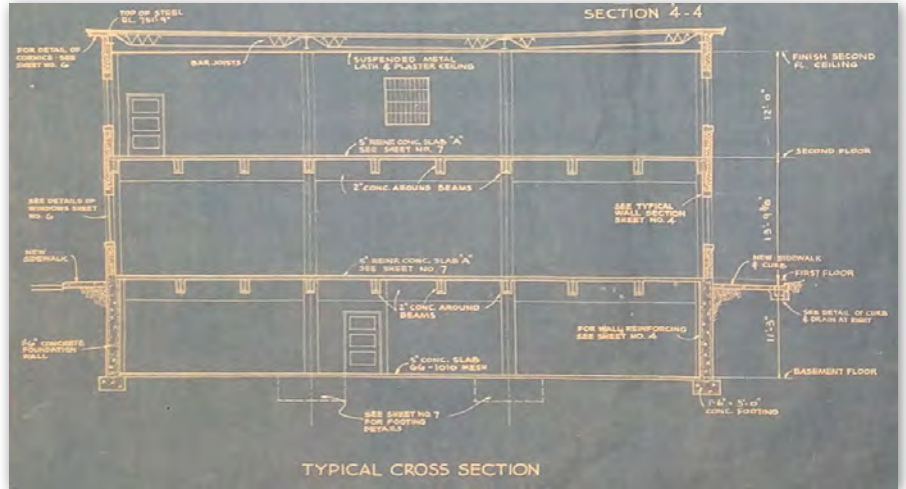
Typical cross section through the building from 1953 blueprints (SCI-Pittsburgh Facilities Archive).
